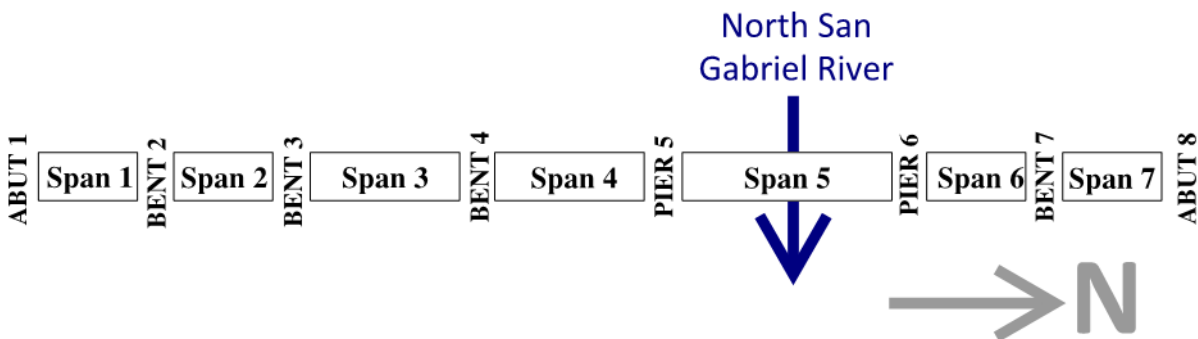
Schematic orientation of North Austin Avenue Bridge; Span 5 includes a 56-foot suspended span between 14-1/2-foot cantilevered extensions from Spans 4 and 6.
